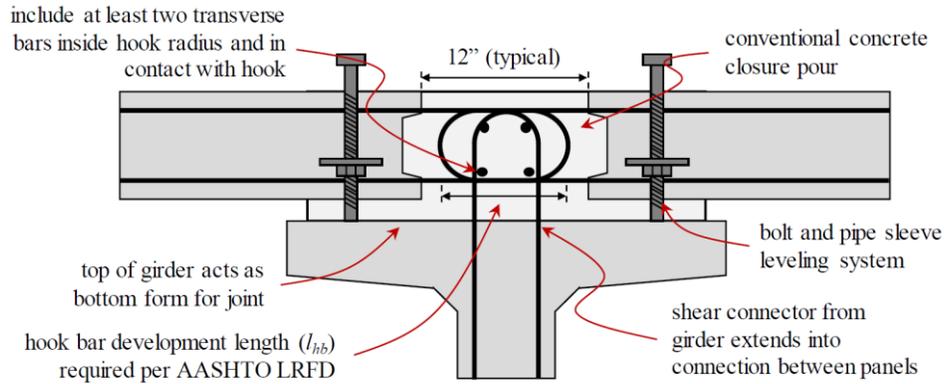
22 Schematic of conventional concrete longitudinal joint over girder [60].
